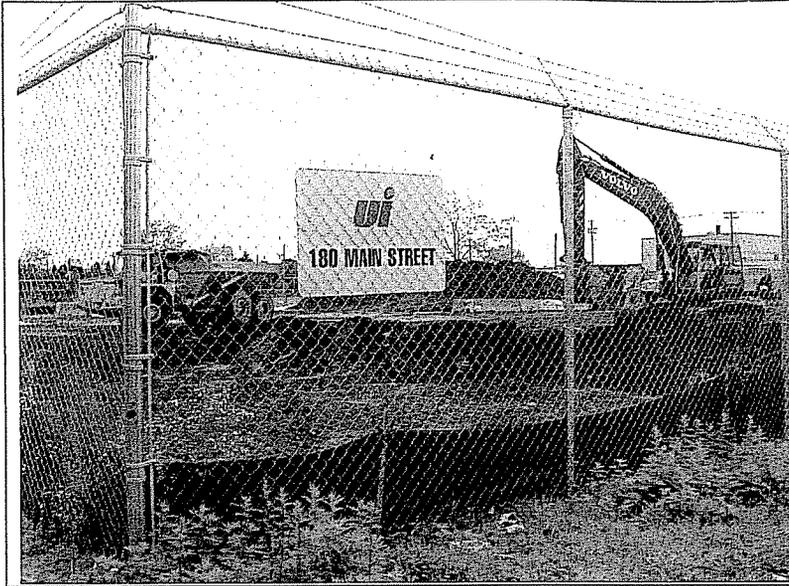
Singer Substation, building excavation. Silt fence on northwest corner of site repaired.
